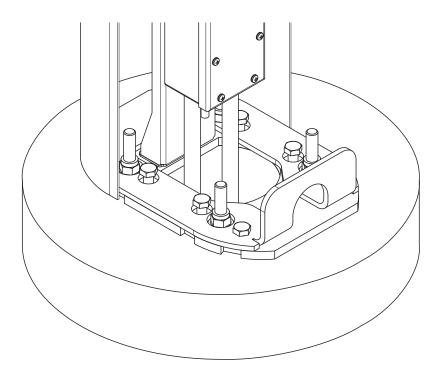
Bottom Conduit Entry (Sectional View of Column)
